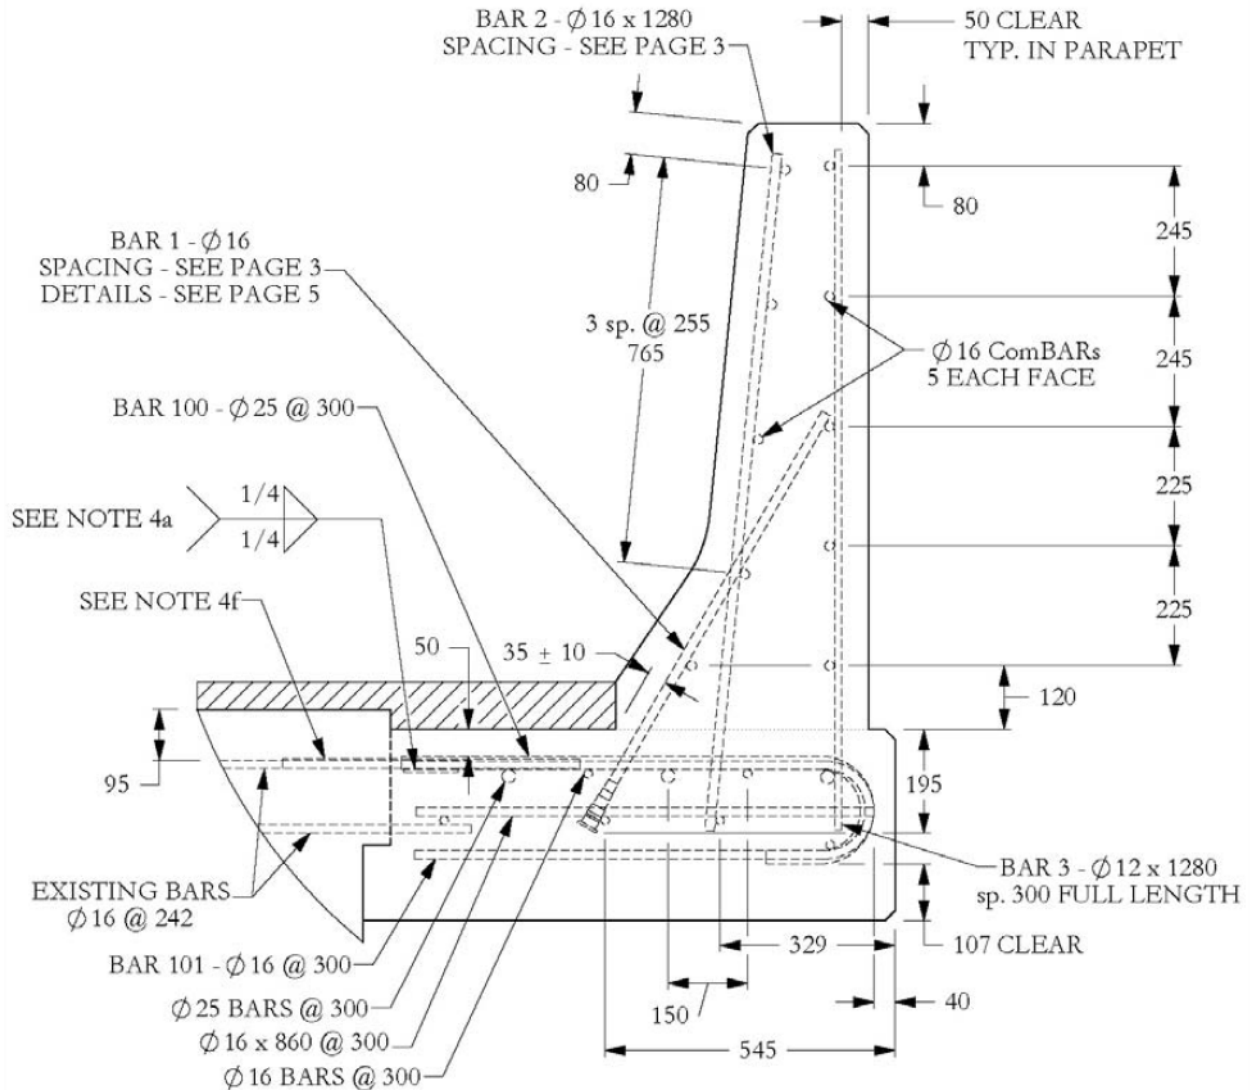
TL-5 Schöck Combar Parapet Dimensions and Reinforcement [20]
